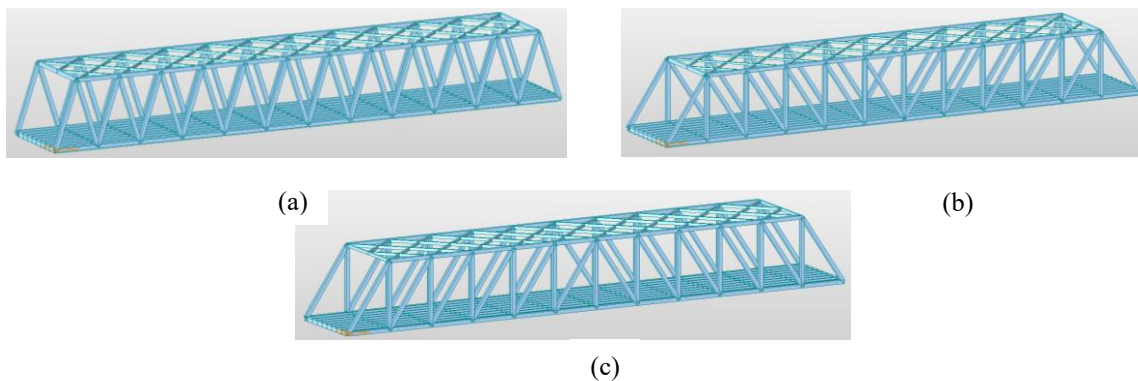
3D Modeling of Steel Truss Bridges: (a) Warren Truss Type, (b) Pratt Truss Type, (c) Howe Truss Type
